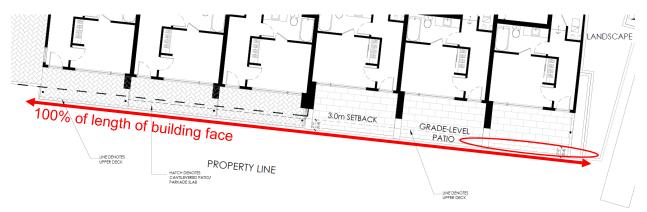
Proposed balcony siting exemption variance (adjacent to 3752 Wetton Road)
